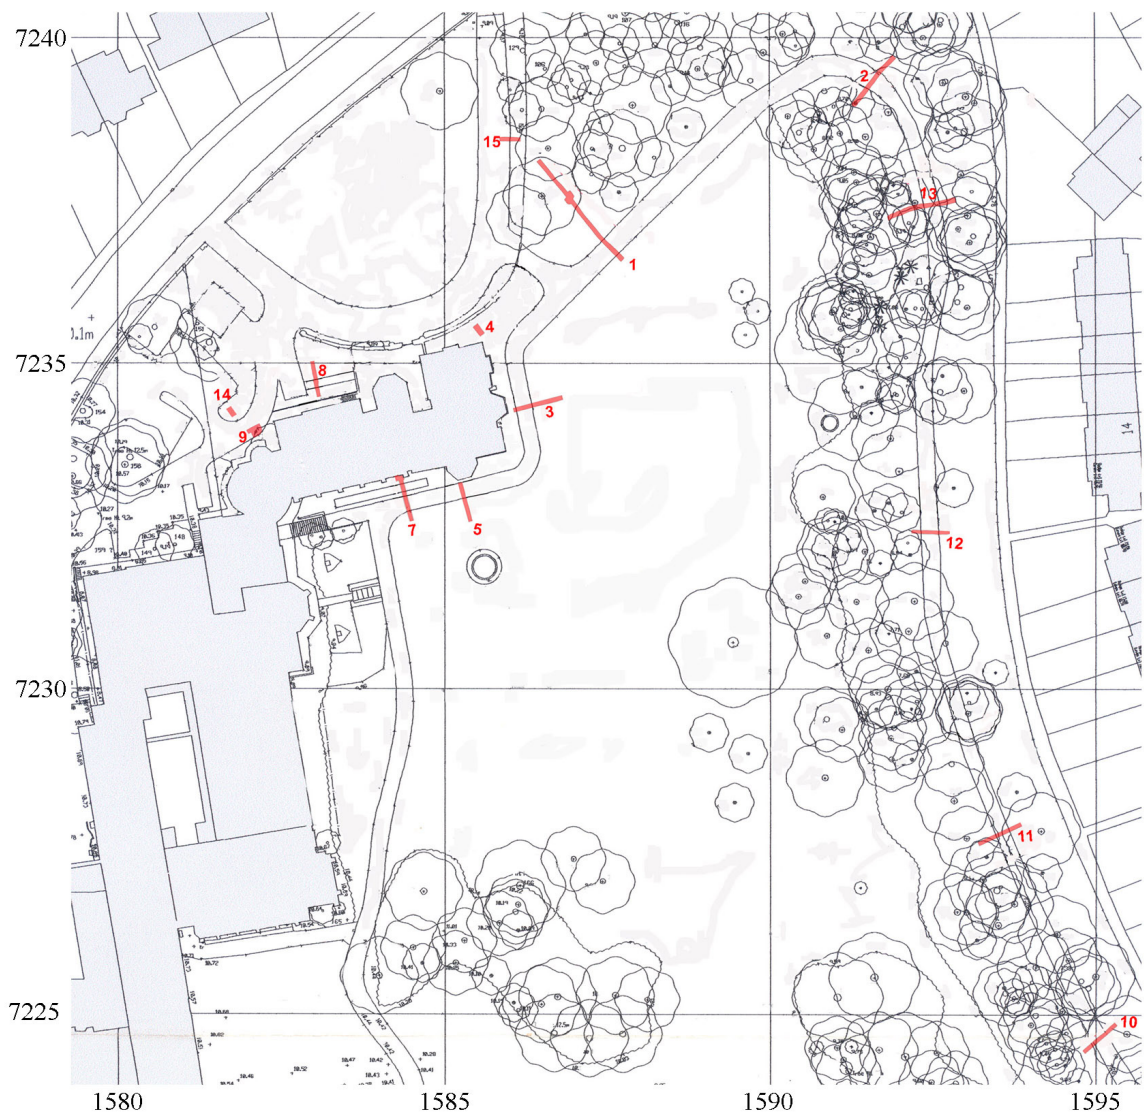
Trench locations based on survey plan provided by Inskip + Jenkins Architects.
